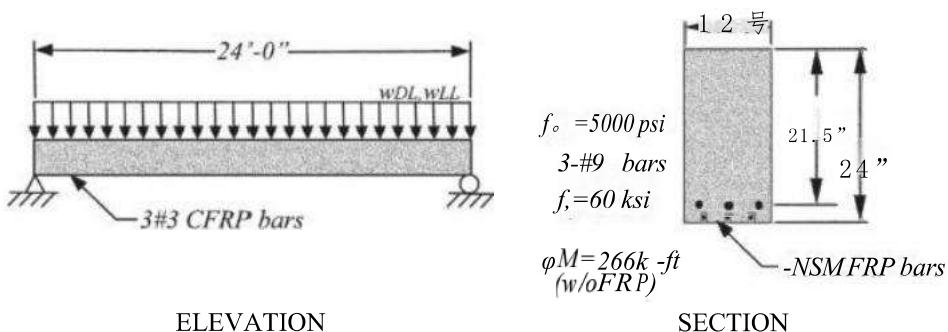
Schematic of the idealized simply supported beam with FRP external reinforcement.(Note:I in.=25.4 mm; 1 kip-ft=1.36kN-m;1 ksi=6.9 MPa;1 psi=0.0069 MPa.)
